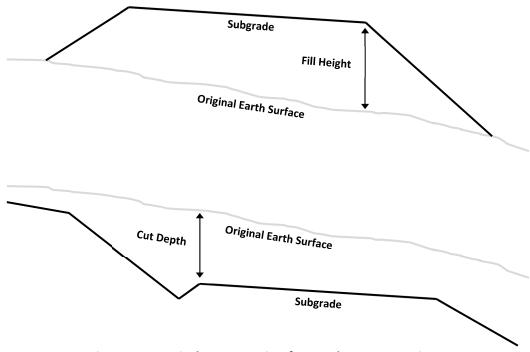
Typical Cross-Section for Roadway Cut Section
